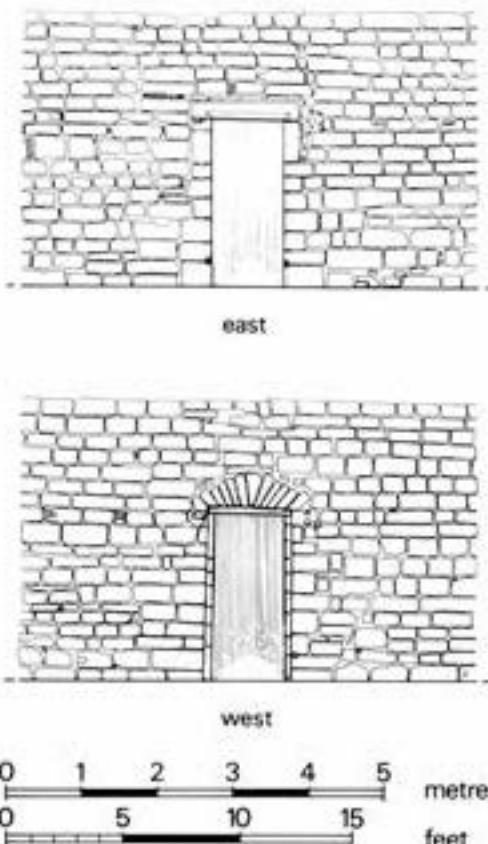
The keep; the east and west elevations of the doorway in the median wall on the first floor; room 8 (above) room 9 (below)
